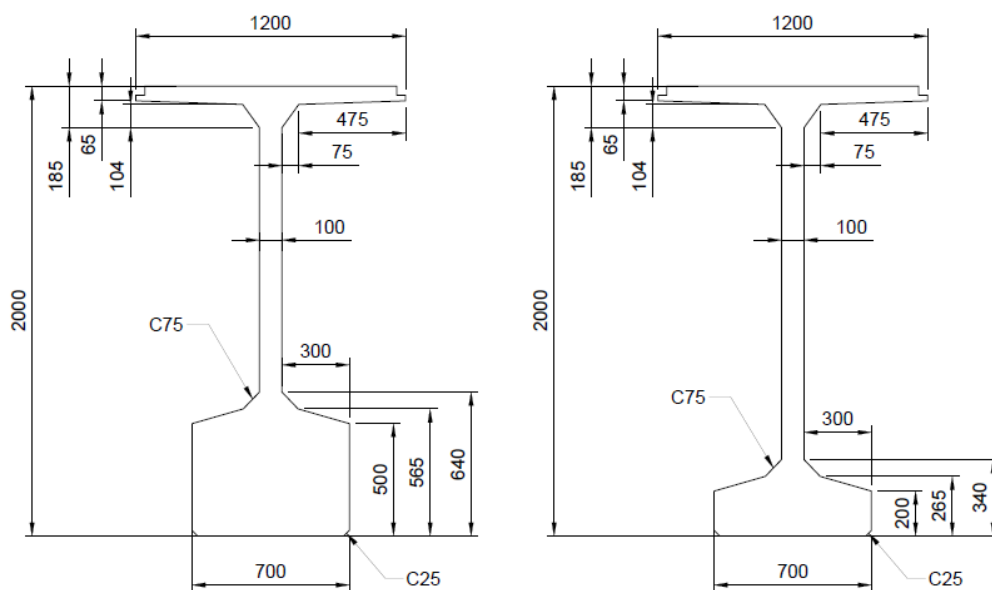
40 Girder section of 45m span UHPFRC post tensioned I girder at support and mid span
